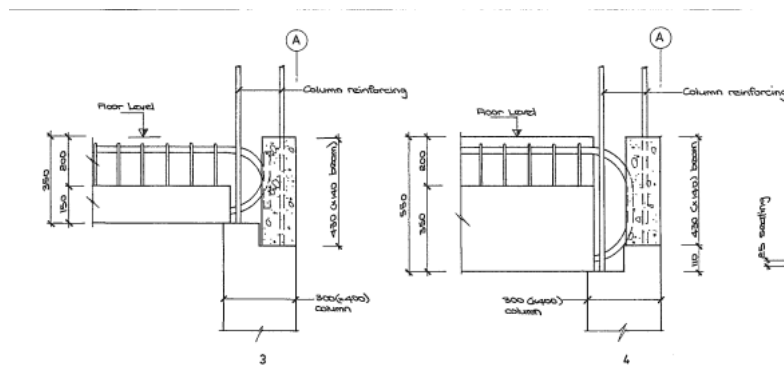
Reinforcement anchorage in Grid A beam column joint zone [1]
